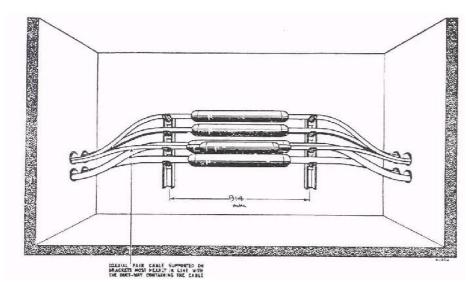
Cables may be elevated to suitable positions (Cable Supports not shown)
